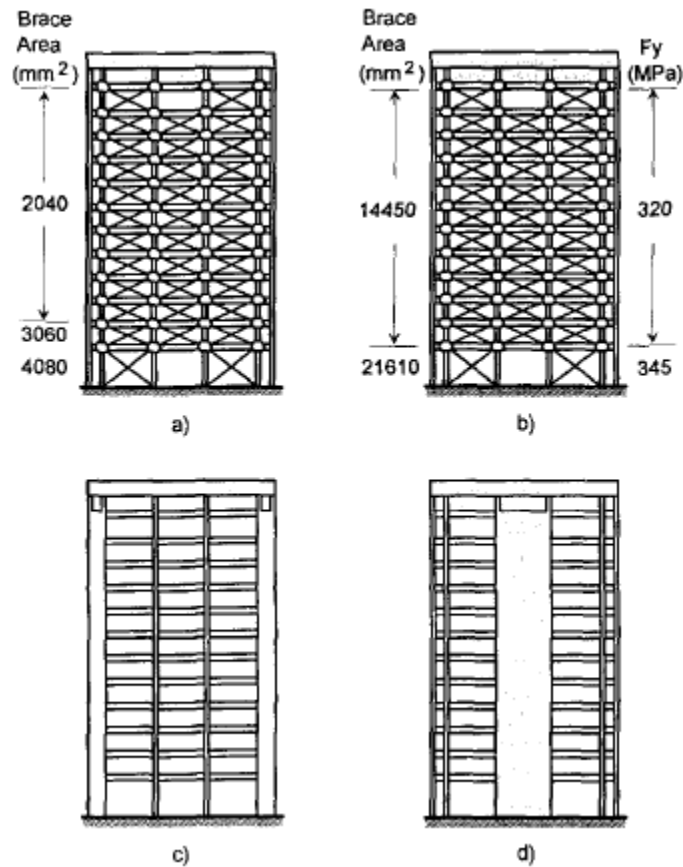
Retrofit Schemes for 12-Story Building: (a) Posttensioned Bracing; (b) X-Bracing; (c) Wall Scheme W1; (d) Wall Scheme W2
